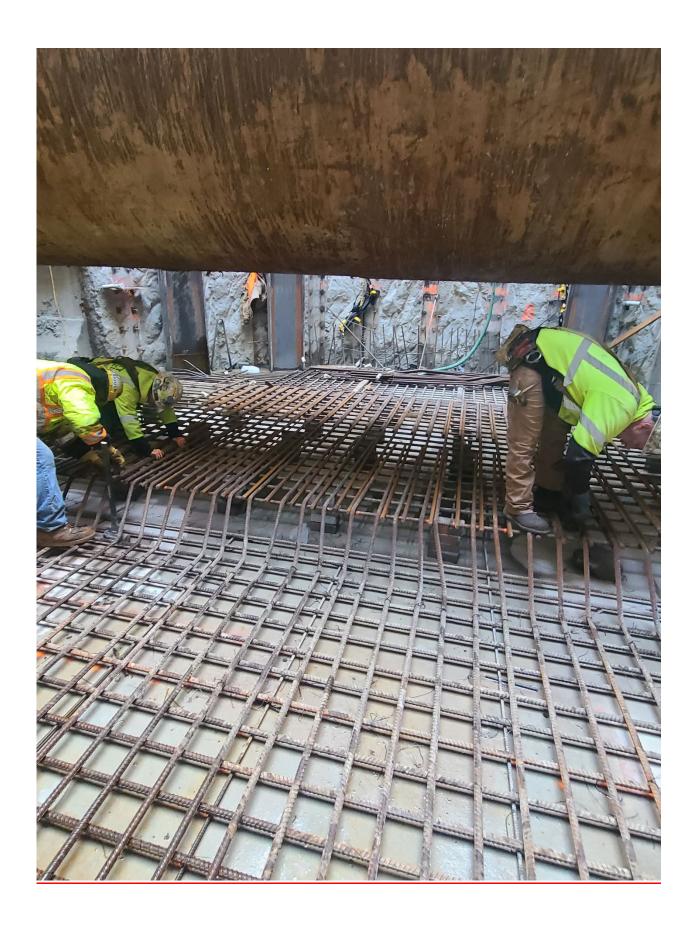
Excavation for Electrical Pad & Conduit Runs
